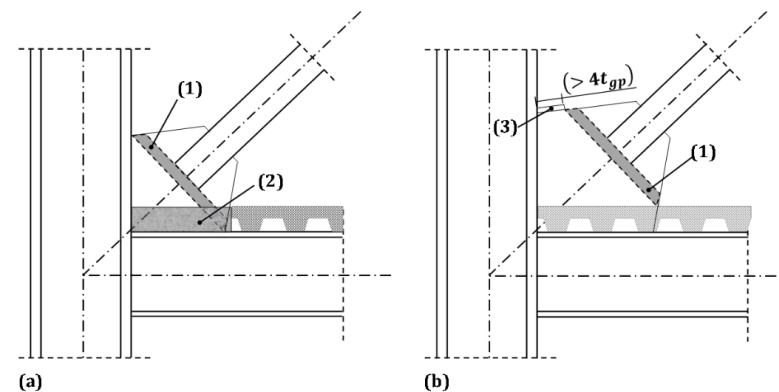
slab-to-gusset details: a) isolated from the slab; (b) restrained by the slab; (1) linear clearance; (2) compressible material; (3) edge stiffener
